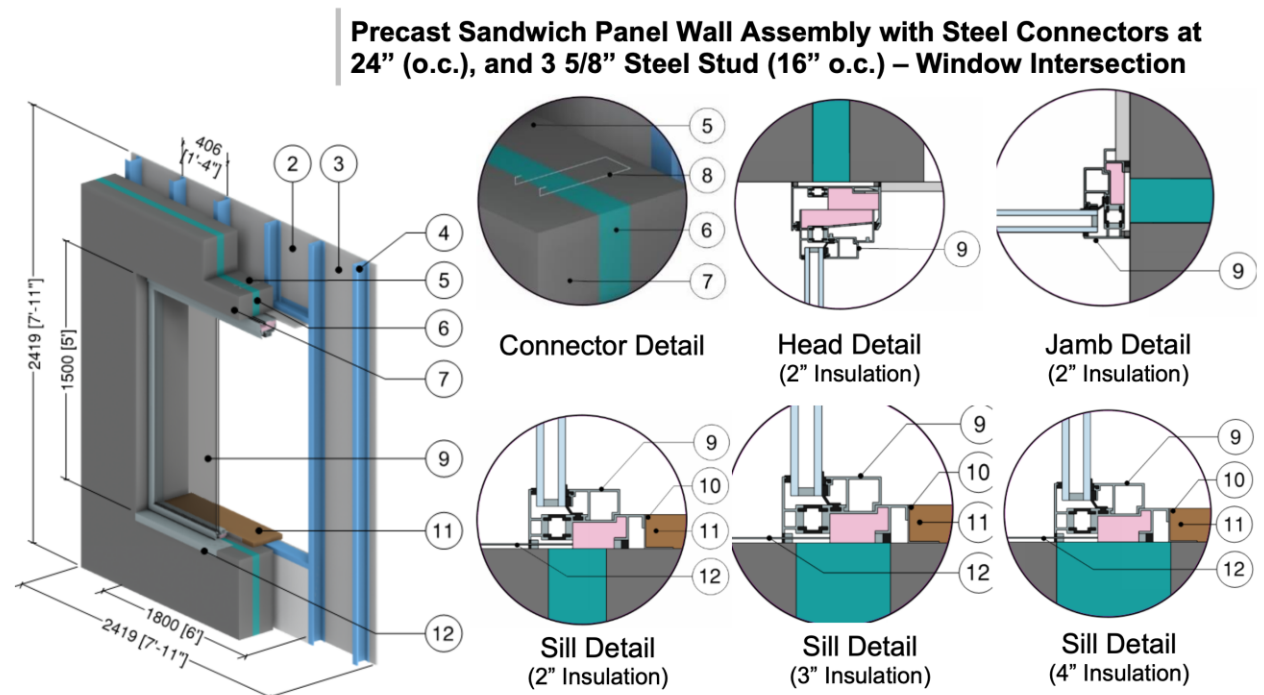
Window installation details for a double wythe precast wall panel (from thermalenvelope.ca)
